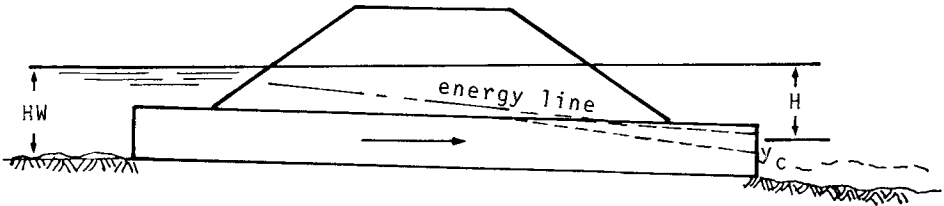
Culvert longitudinal sections illustrating inlet control conditions
